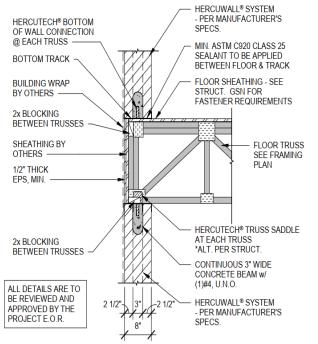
HercuWall® Truss Perpendicular to Wall (Section)
